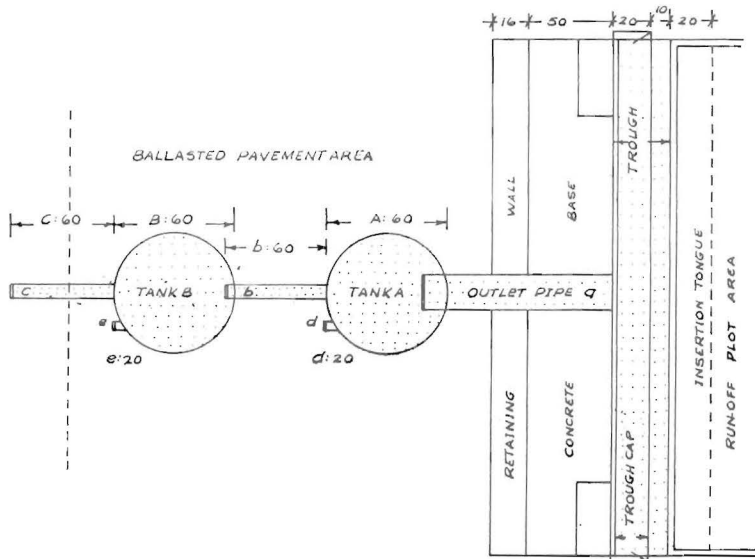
Top-view of tank A & B, outlet a, b, c, d, e, trough, retaining wall and concrete base (unit: cm).
